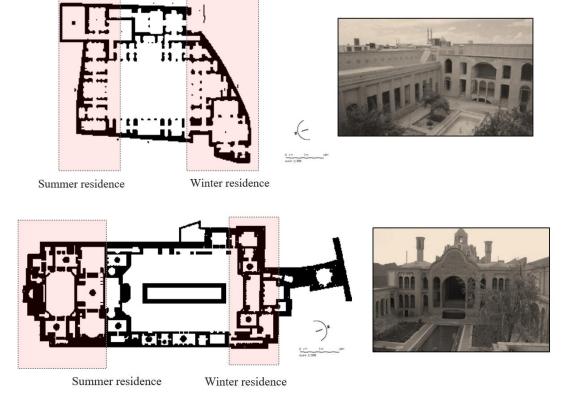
Samples of Local Dwellings' Plans in Hot and Dry Climates (Source: Ali et al., 2020)
